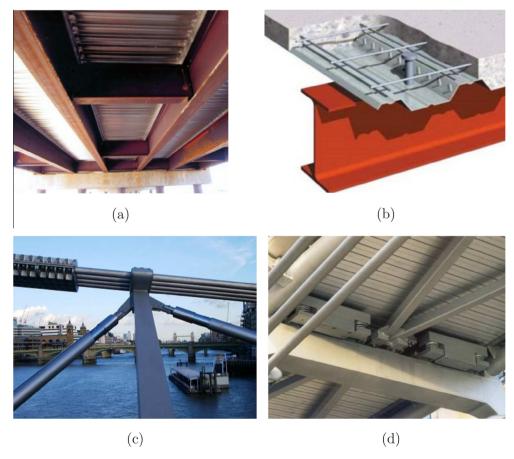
(a) Steel girders of a bridge crossing Box Elder Creek in Watkins, Colorado, USA (from www.shortspansteelbridges.org, accessed on 08/09/2014); (b) detail of a composite beam consisting of a concrete slab, steel girders and shear connectors (from www.theconstructor.org, accessed on 08/09/2014); (c) viscous dampers used in the Millennium Bridge, London, UK (from www.mace.manchester.ac.uk, accessed on 09/09/2014); (d) tuned mass dampers employed in the Millennium Bridge, London, UK (from www.gerbusa.com, accessed on 09/09/2014).
